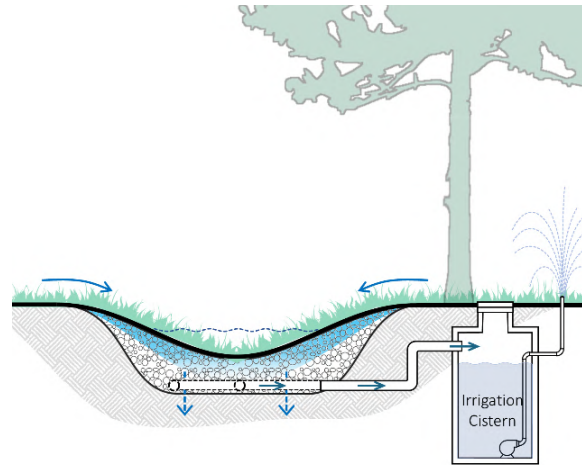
A schematic cross section of swale system supplemented with stormwater harvesting and reuse tank (By Author)
